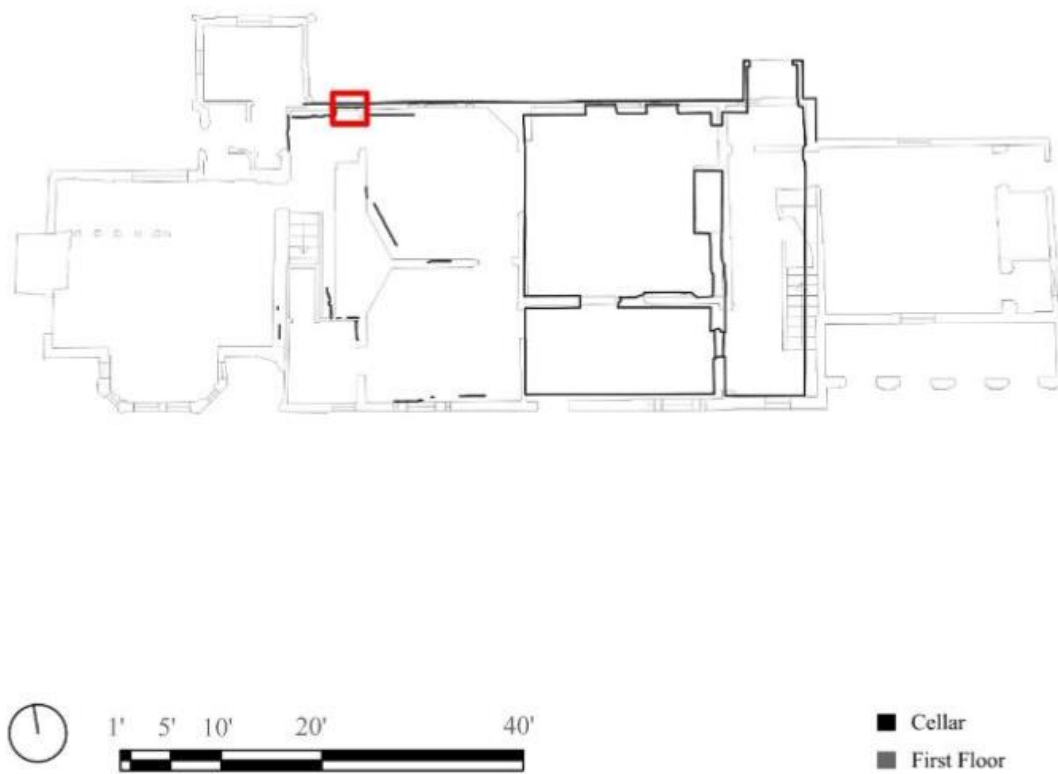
The location of the bricked off window or door captured by 3D data in the cellar floor plan overlaid over the first-floor plan. Overlaying these two plans reveals that this door or window is located under Campaign Three. While it is unknown whether this was a door or a window, this impression suggests that this cellar space may have been accessible in its earlier history.
